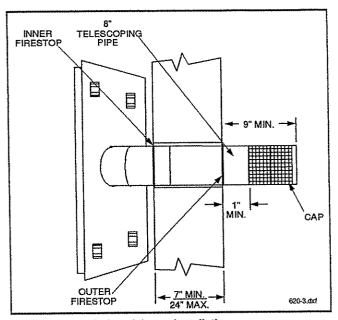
Extended straight out installation (7" - 24" wall thickness).
